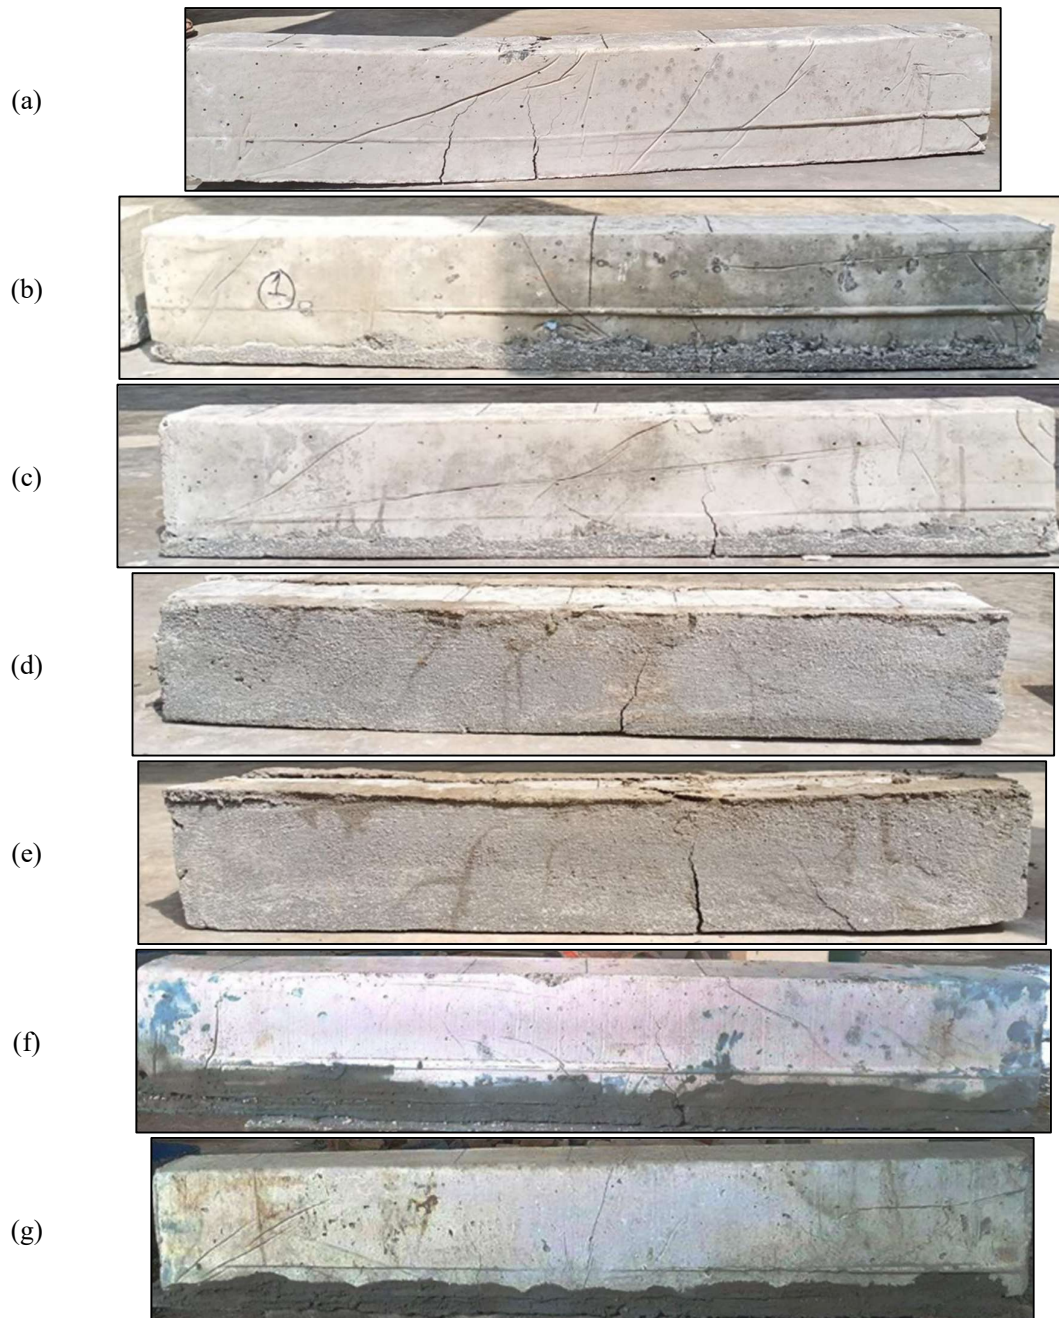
Failure Pattern of (a) Control Beam, (b) R1 Beam, (c) R2 Beam, (d) R3 Beam, (e) R4 Beam, (f) R5 Beam, (g) R6 Beam.
